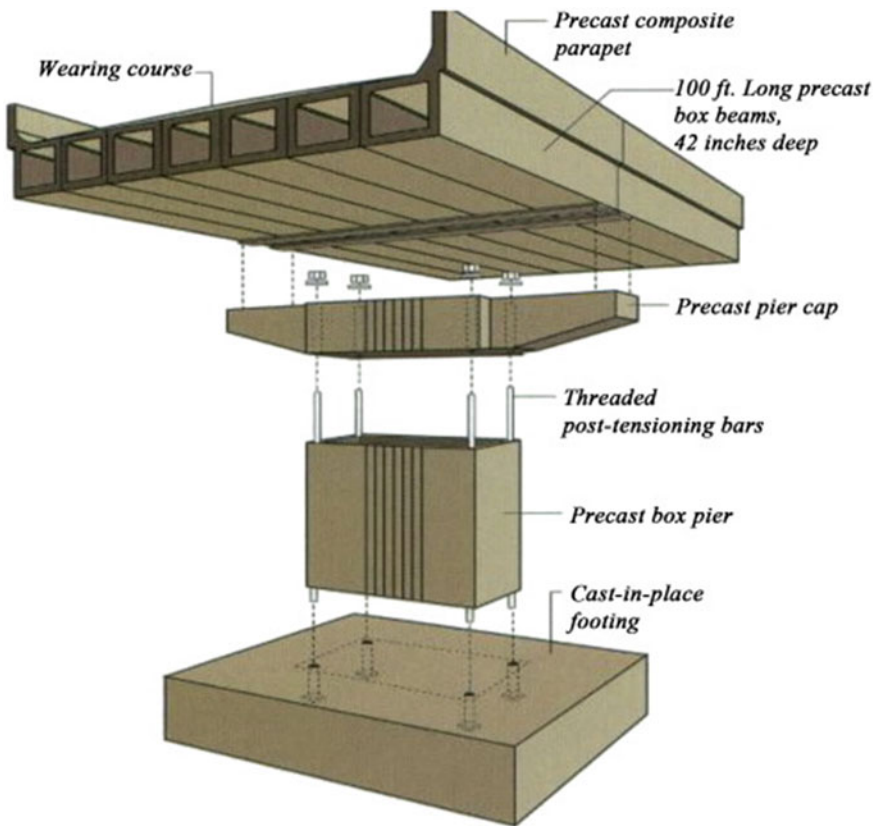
Prefabricated accelerated bridge construction (Mohiuddin, 2015)
